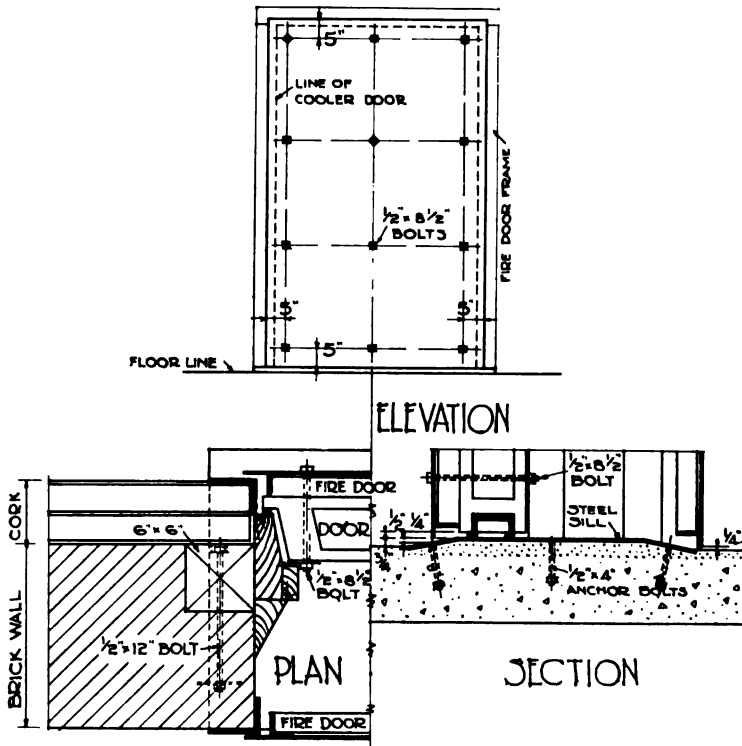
REFRIGERATOR DOOR BOLTED TO STEEL FIRE DOOR.
